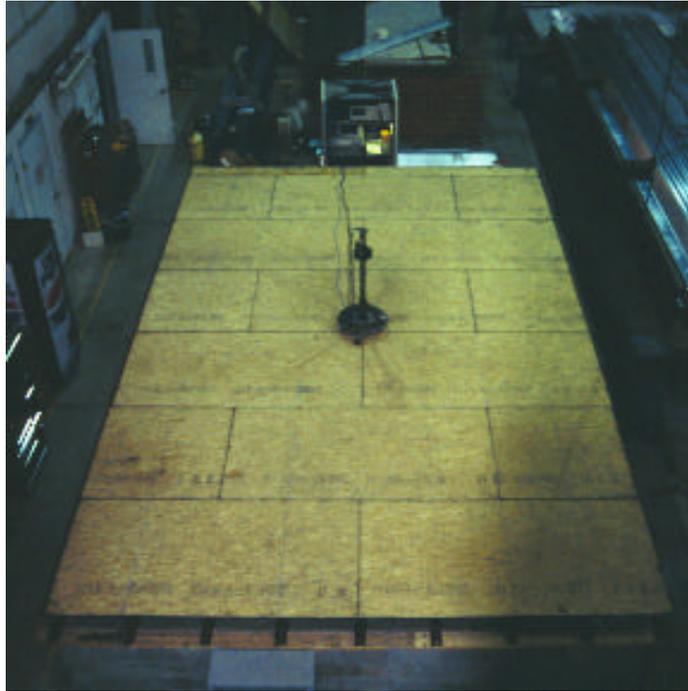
HDS, Force Plate and Accelerometer Located at midspan of Floor
